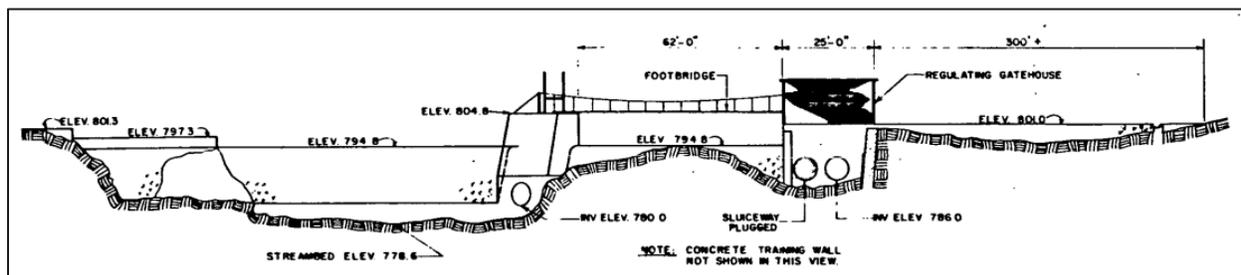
Jackson Dam plan cross section (USACE, 1980)
